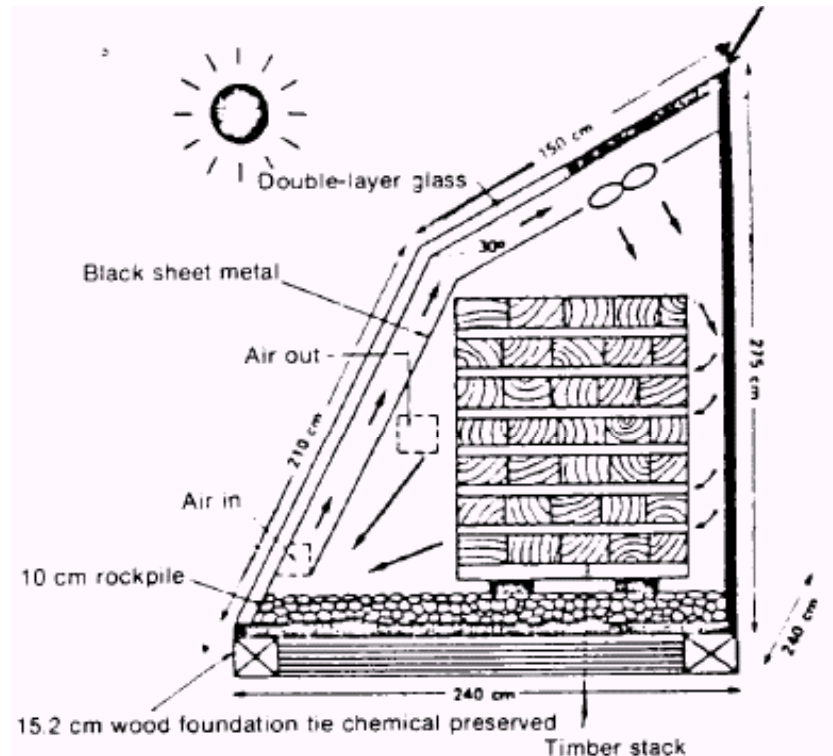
Cross section of a solar timber dryer at Thunder Bay [53]
